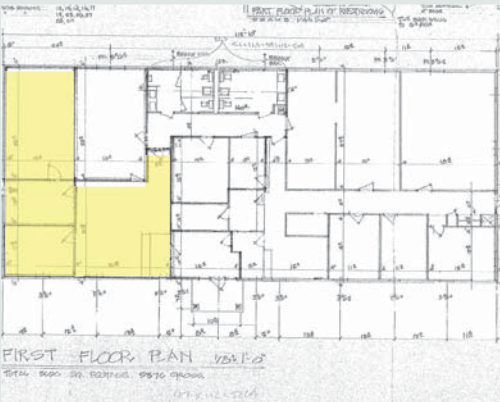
Existing Floor Plan of FSA-SCD Building with Non-Shared FSA Suite Spaces Highlighted
